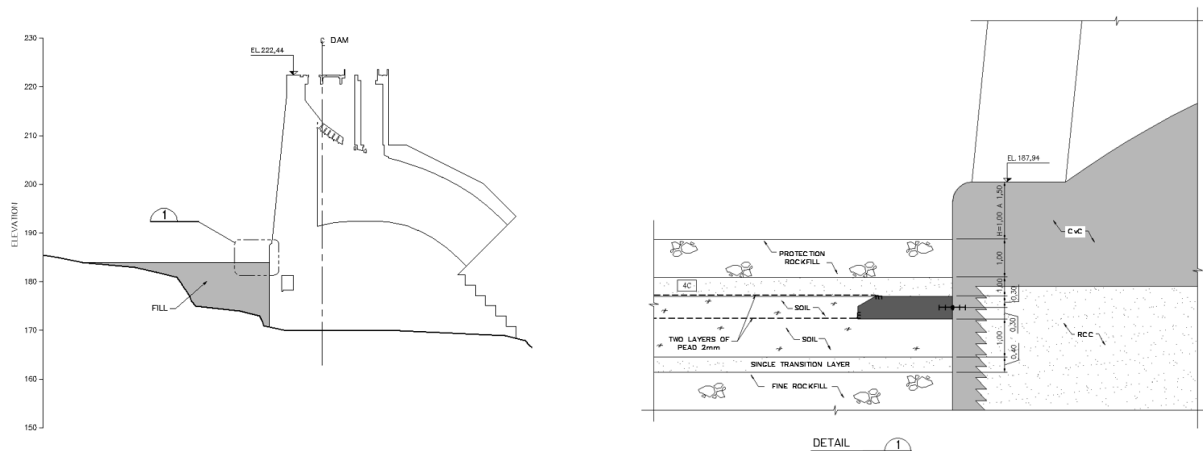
Upstream impervious blanket – Detail showing fill and PEAD layers
